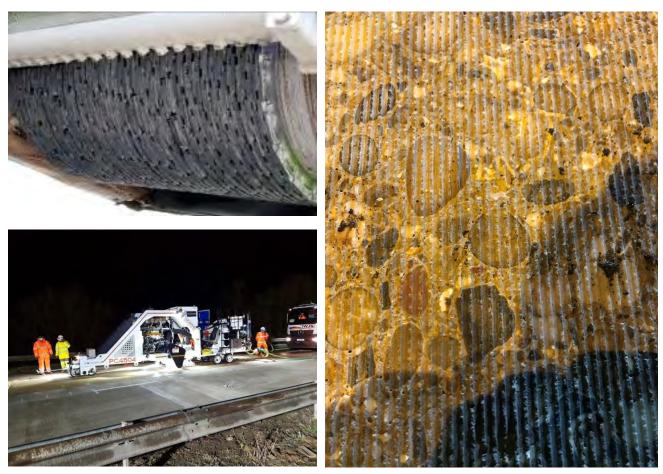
Longitudinal diamond grinding equipment (left) and typical finished surface (right)
